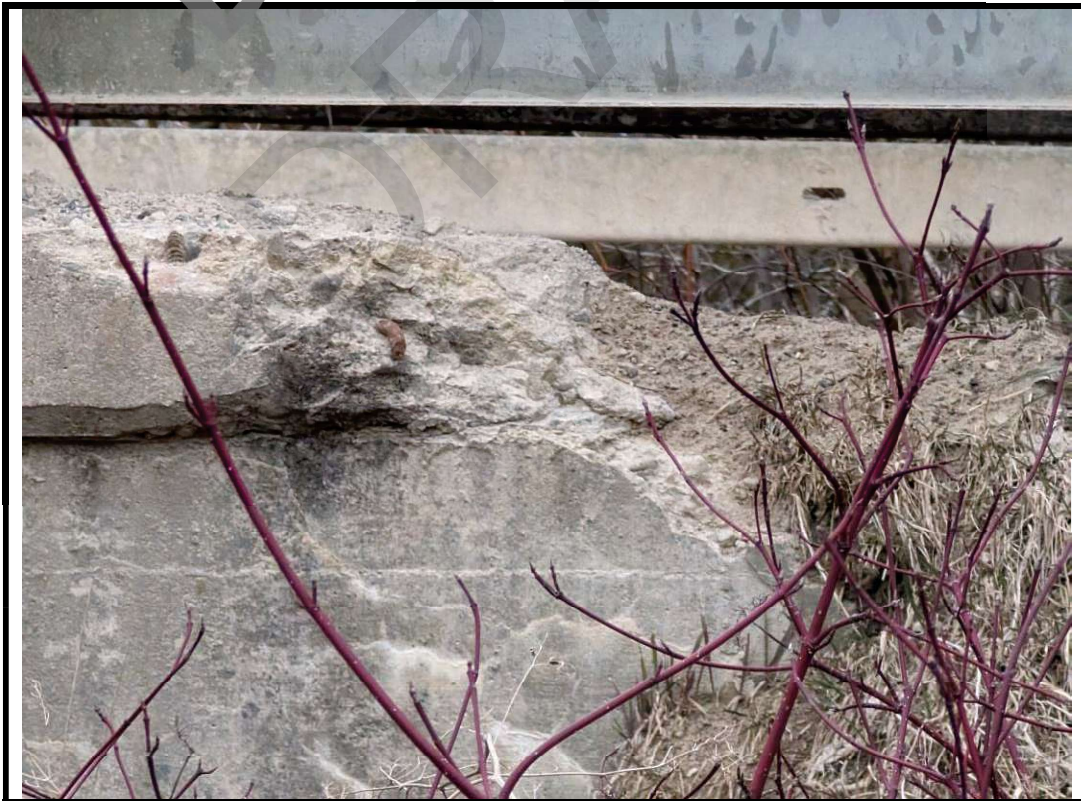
Large spall with exposed corroded reinforcement at northwest wingwall
